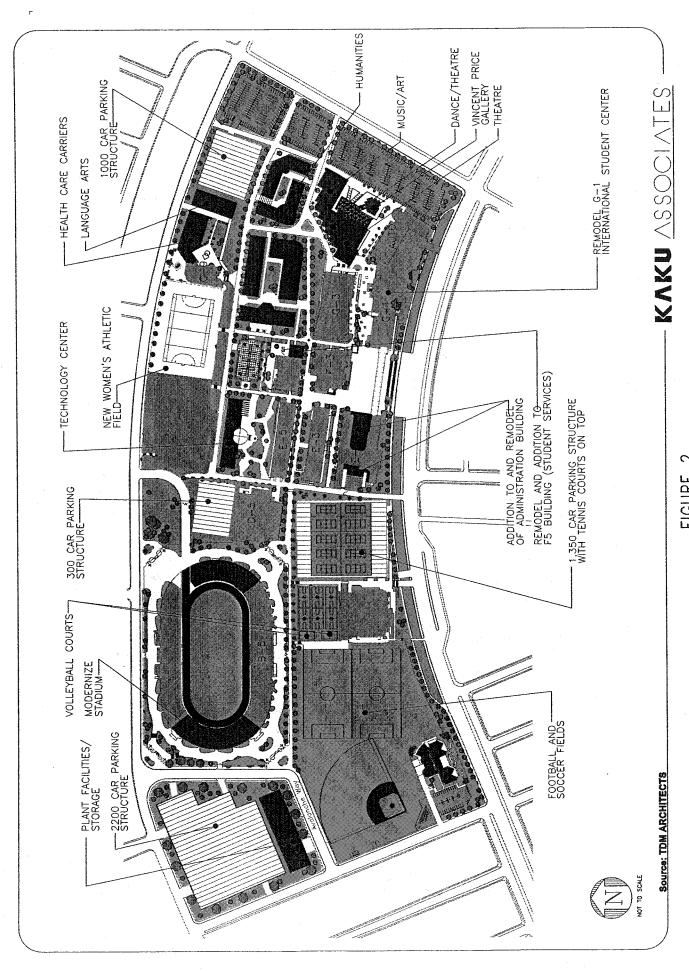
EAST LOS ANGELES COLLEGE CAMPUS MASTER PLAN
